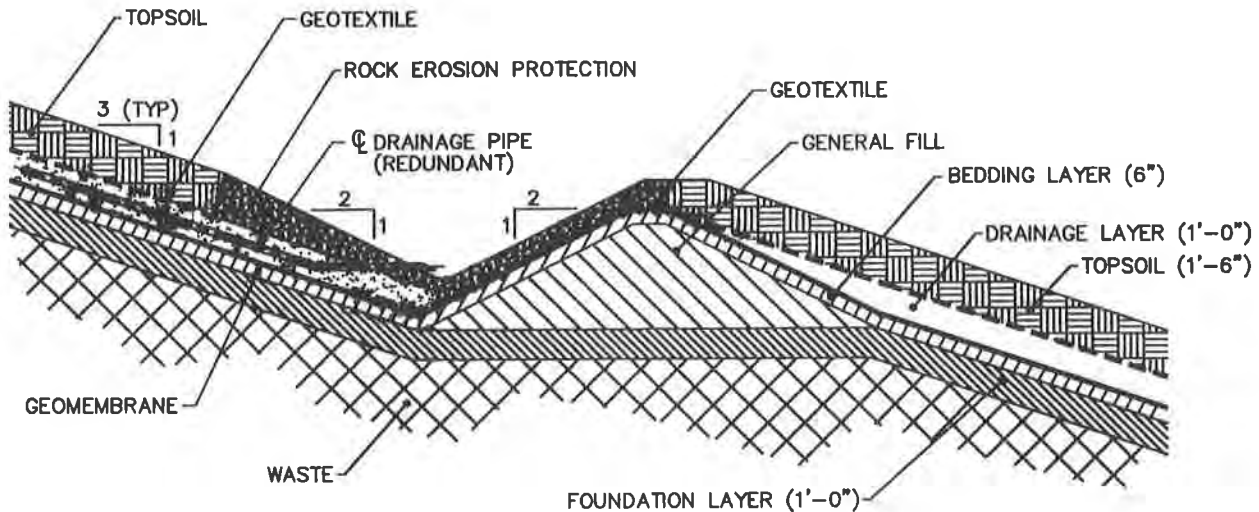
TYPICAL LANDFILL COVER SECTION WITH GEOMEMBRANE BARRIER LAYER AND INTERMEDIATE BENCH DITCH
